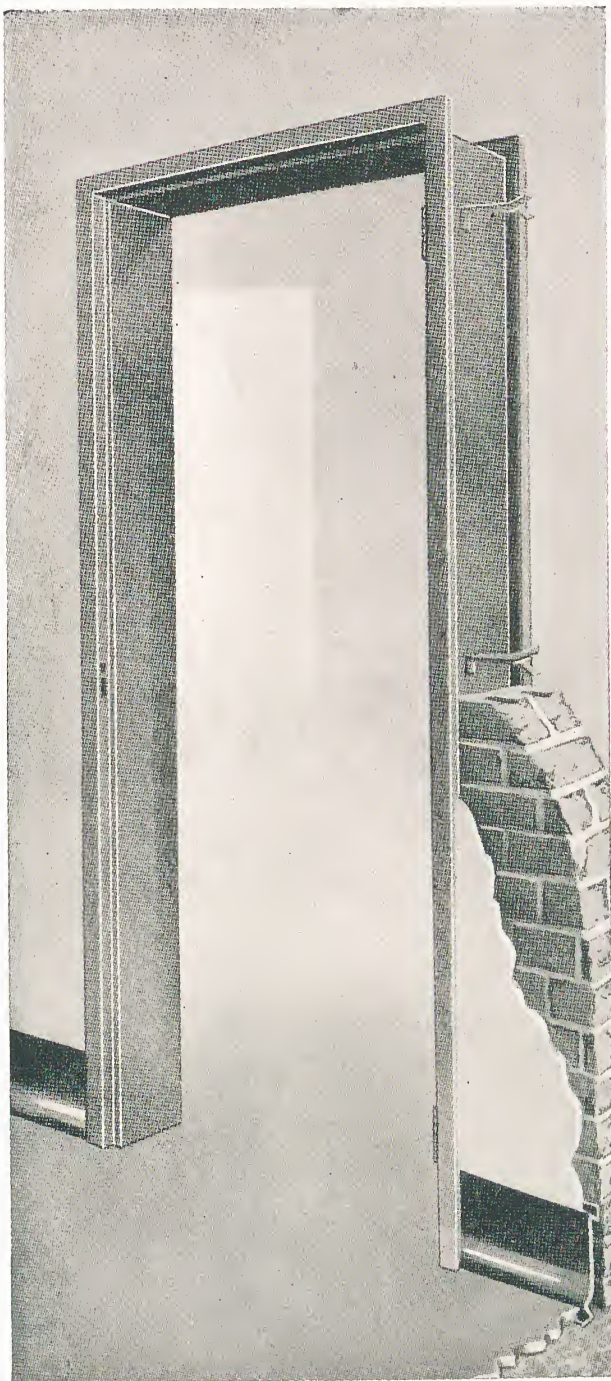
STEEL DOOR FRAME AND SKIRTING.
